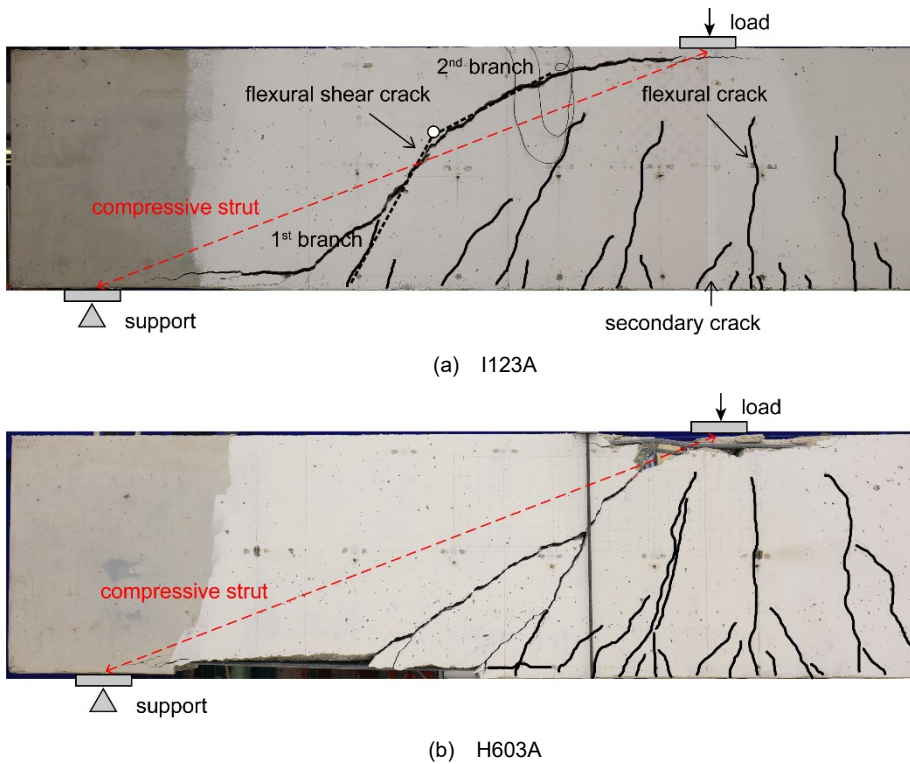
Crack pattern at: (a) flexural shear failure of test I123A and (b) shear compression failure of test H603A (taken from test series described in Chapter 5).
